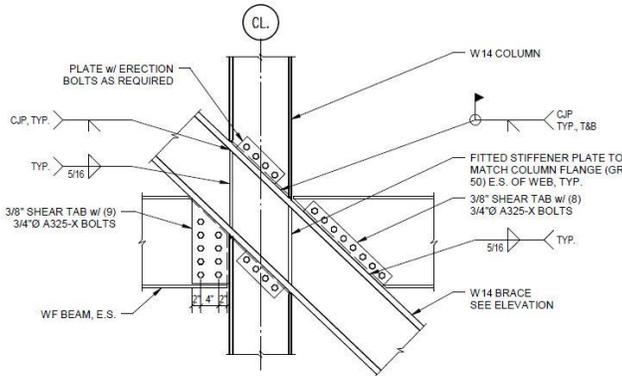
Truss Diagonal Joint Detail (Construction Documents)
